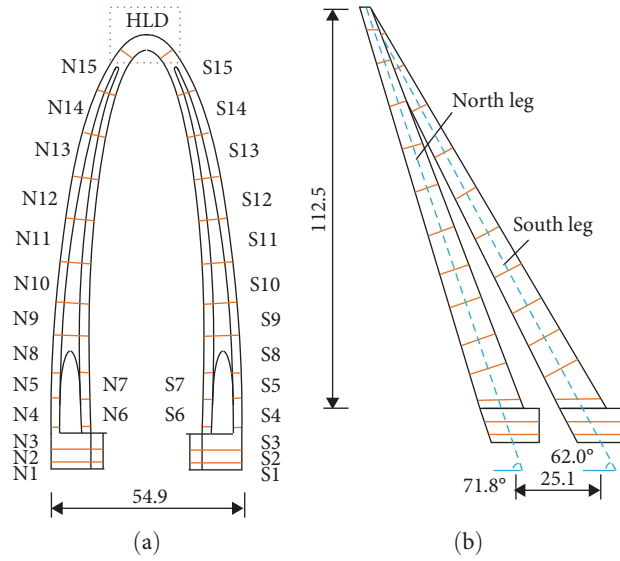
Different views of high pylon. (a) Transverse direction of bridge. (b) Longitudinal direction of bridge.
